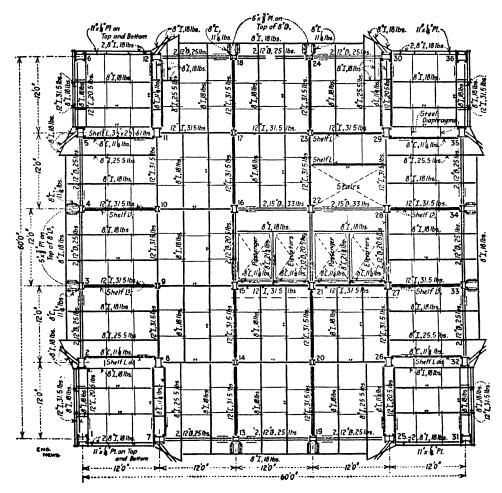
TYPICAL FLOOR PLAN OF SINGER TOWER.
